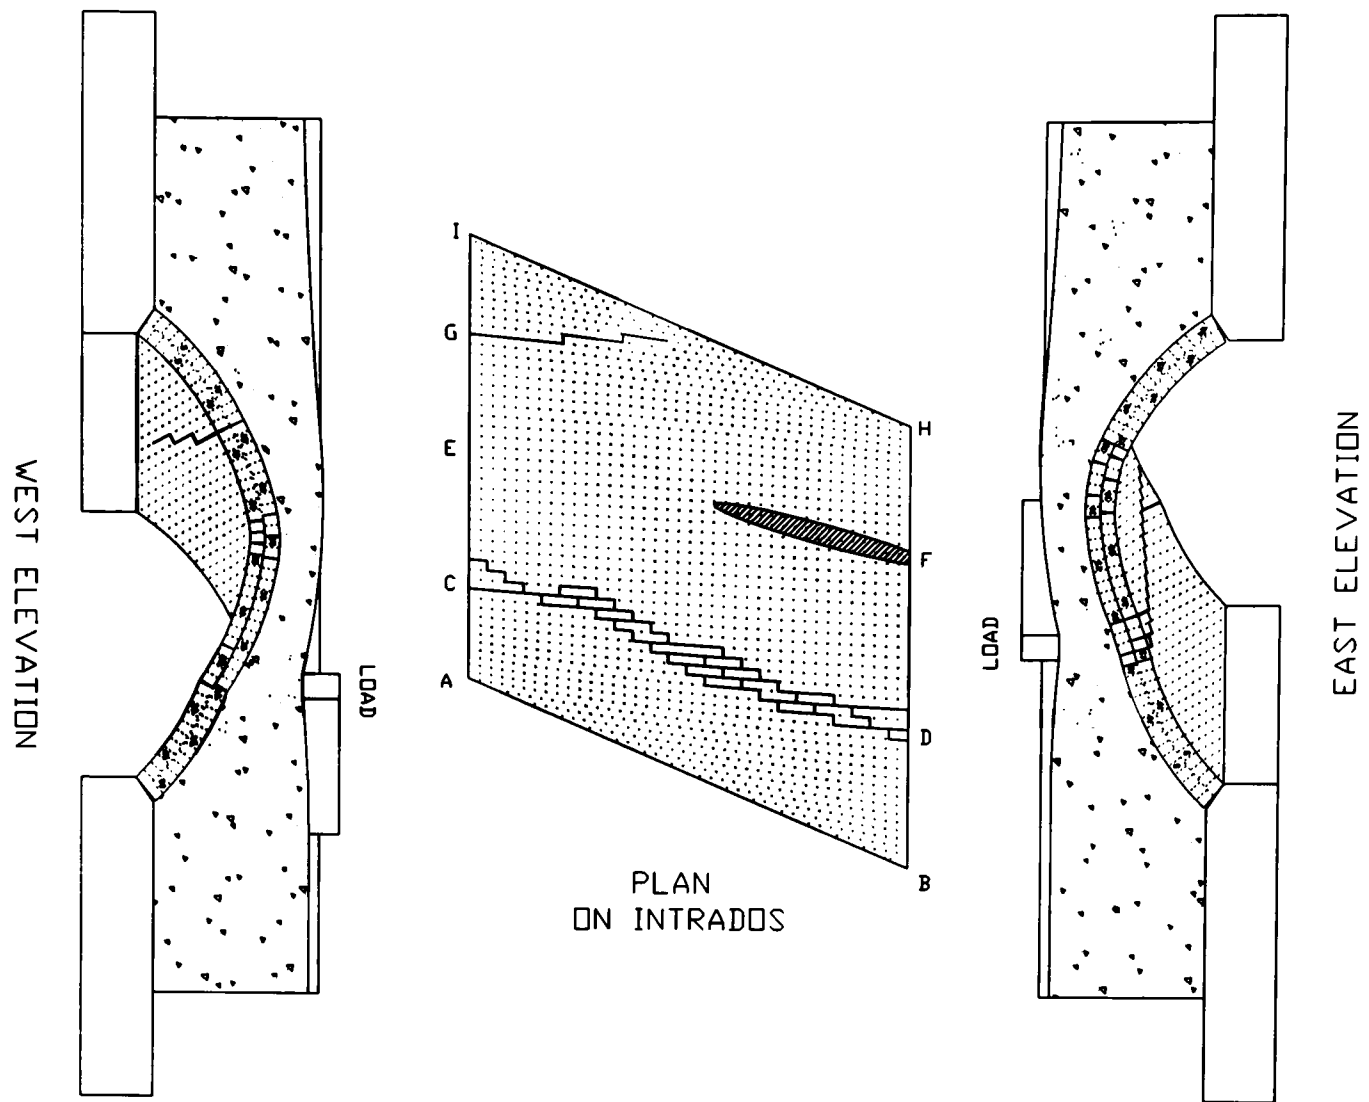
Collapse mechanism of skewed arch bridge 3-1
